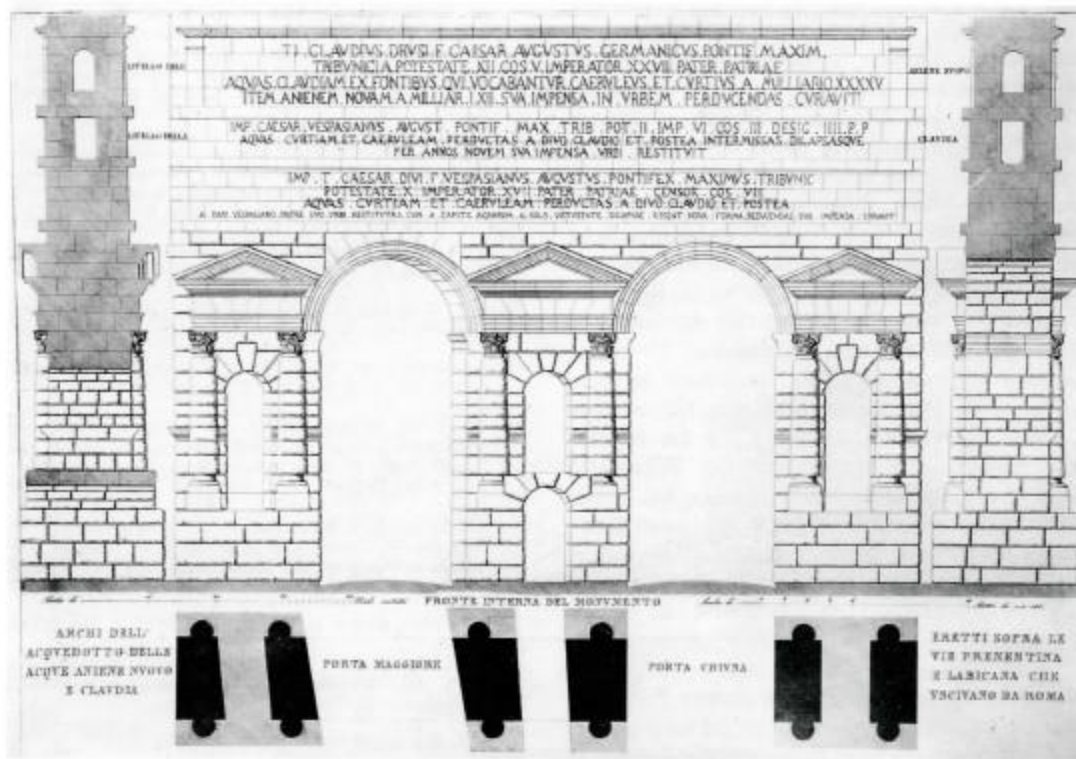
Elevation and ground plan of the Porta Maggiore (Fig. 5, p. 249, Hesberg 1991)
